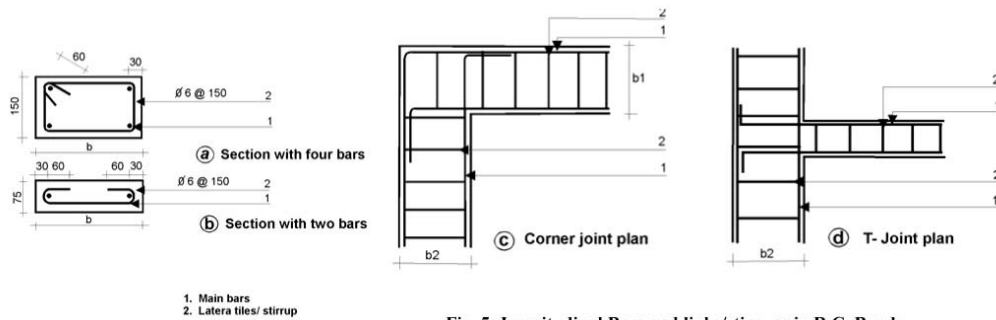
Longitudinal Bars and links/stirrups in R.C. Bands
